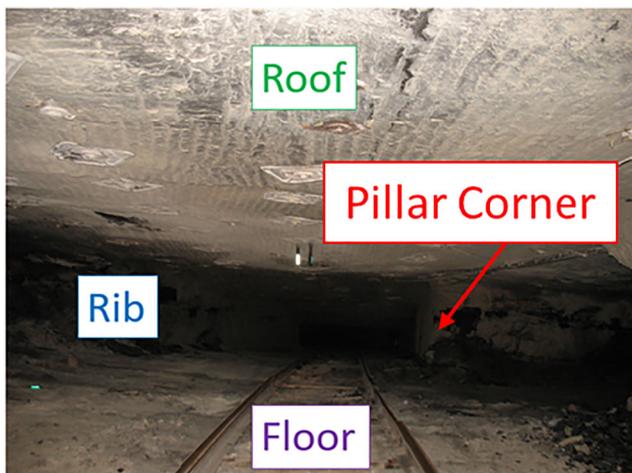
Photo of an underground coal mine entry showing the roof, rib, floor, and the corner of a pillar
